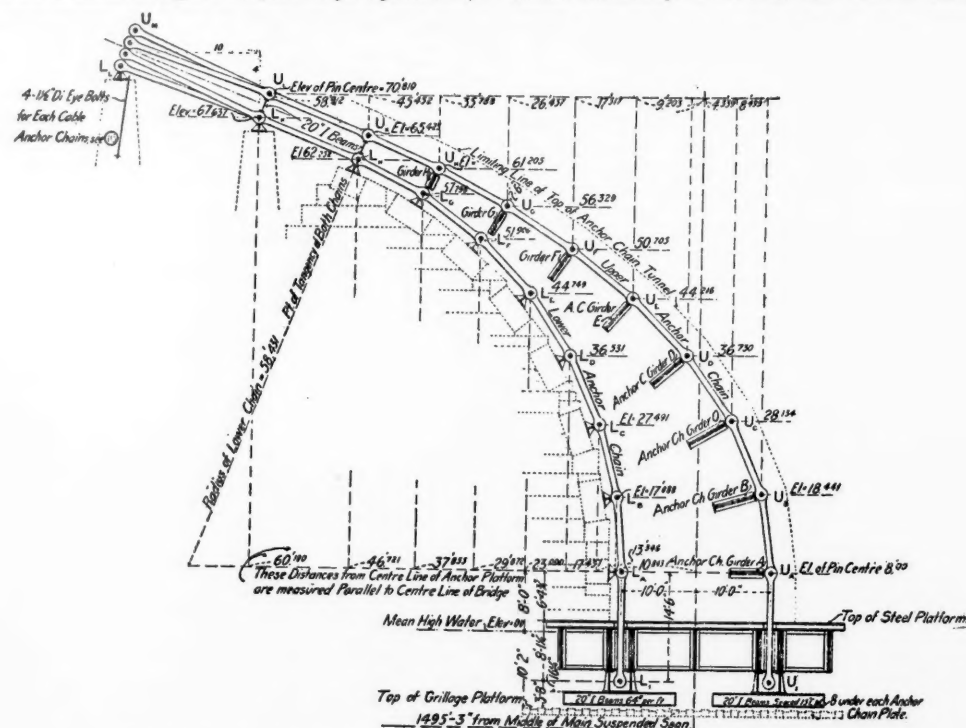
General Arrangement of Anchorage Chains and Girders, New East River Bridge.
